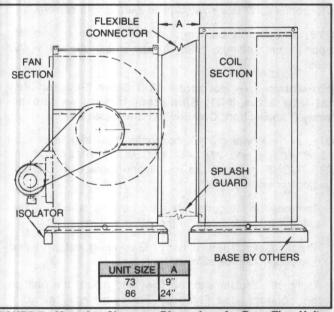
Mounting Clearance Dimensions for Draw-Thru Units Sizes 73-86
